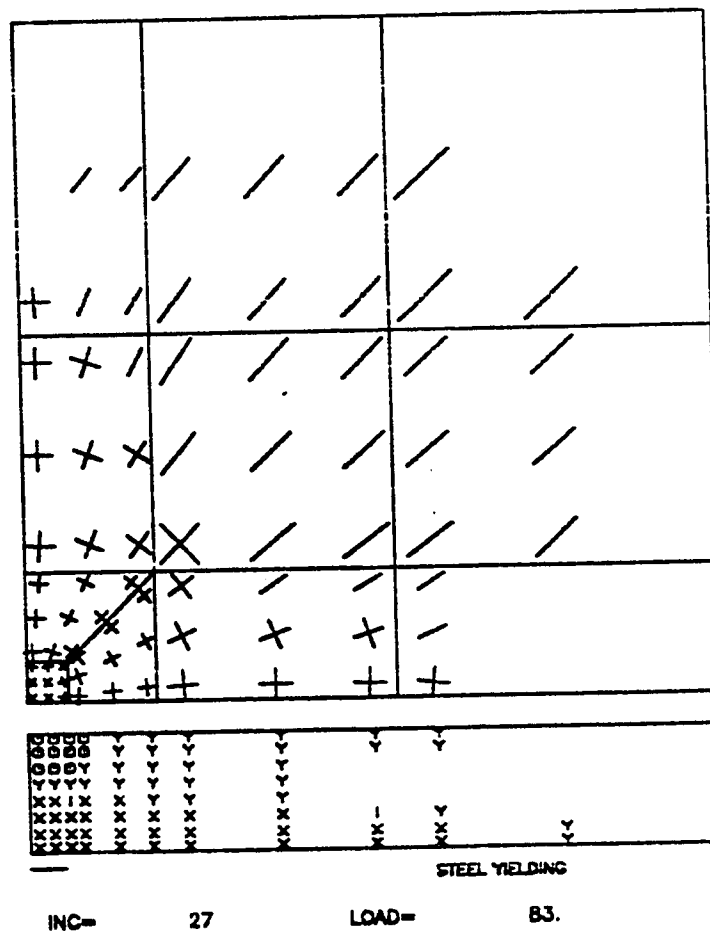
Cracking in bottom of slab and section profile for $\rho = 6.28\%$
